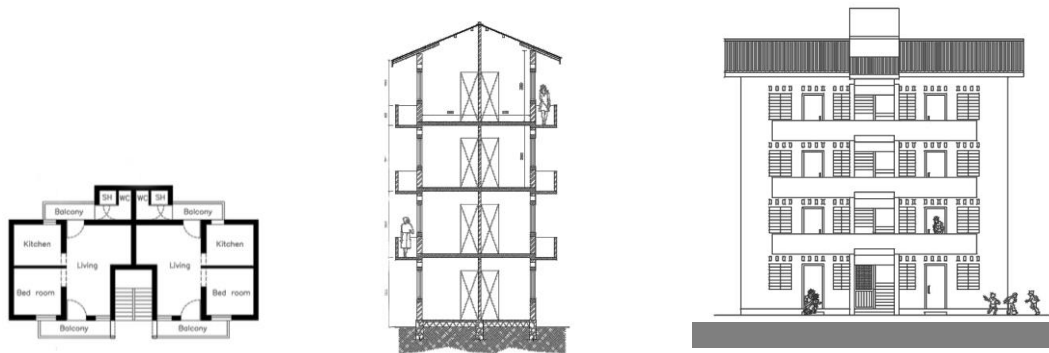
Housing types; Typical floor plan; Single bedroom/ 2-unit plan, section elevation
